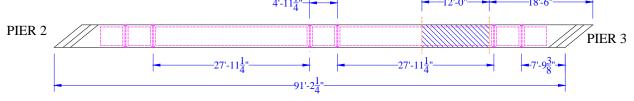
Plan View of Span 3 Beam 19 of Lakeview Drive Bridge
